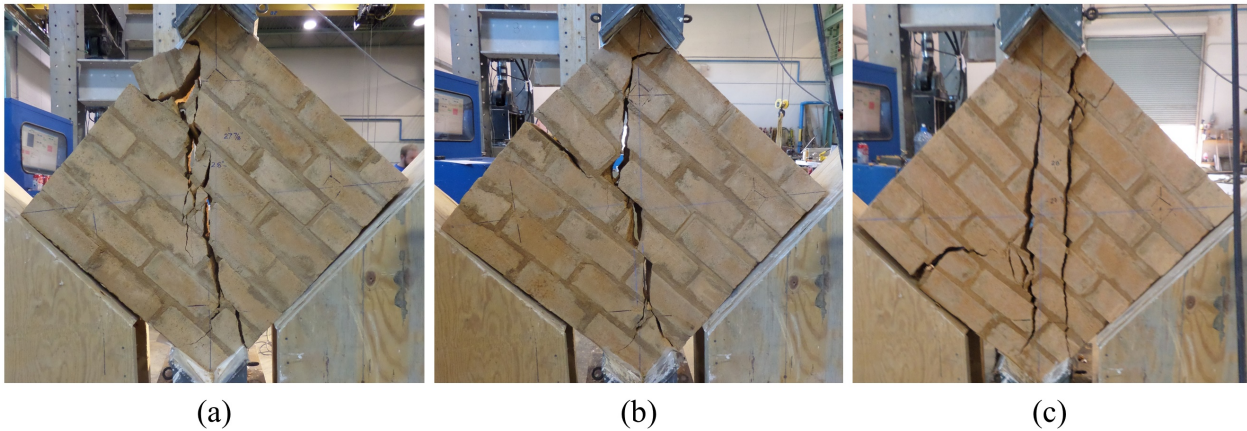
Experimental crack patterns of the unreinforced CSEB masonry wallettes: (a) Wall-1, (b) Wall-2, and (c) Wall-3.
